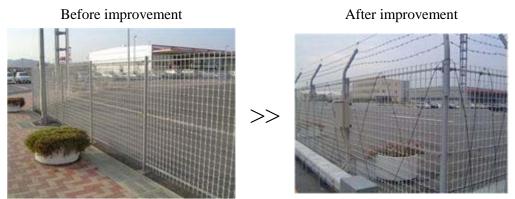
Examples of Improvement Plans for Existing Fence
